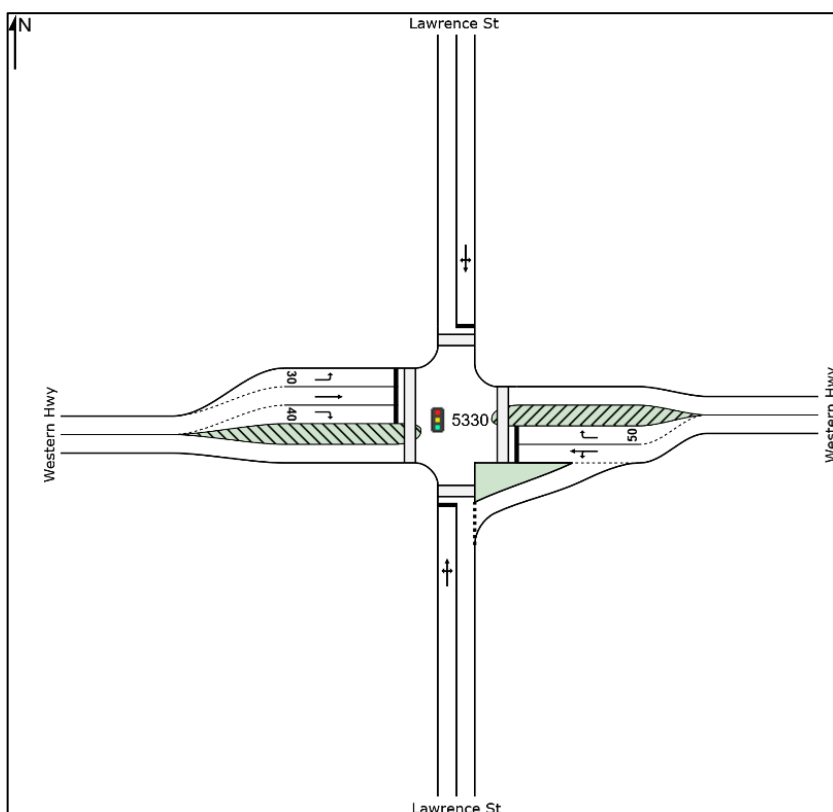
Intersection layout for Western Highway and Lawrence Street
